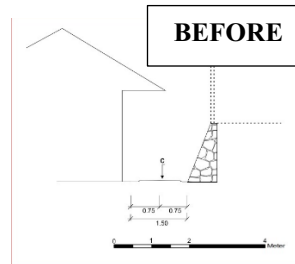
Construction of a Box Culvert on a 1.50-meter-wide road
